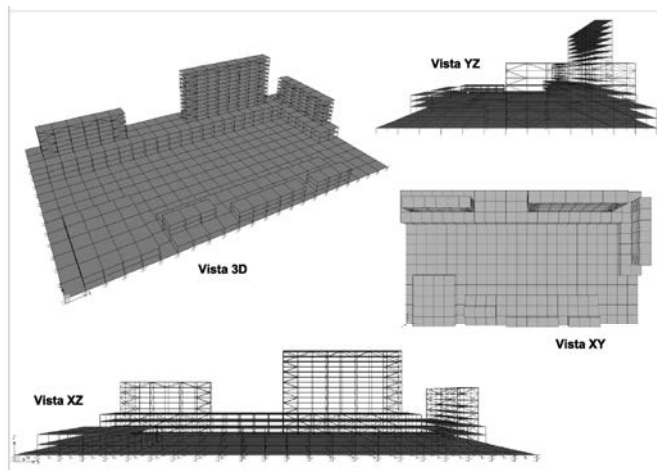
Finite element model of an artificial "isolated" ground with overlying buildings of 1 to 15 storeys.
